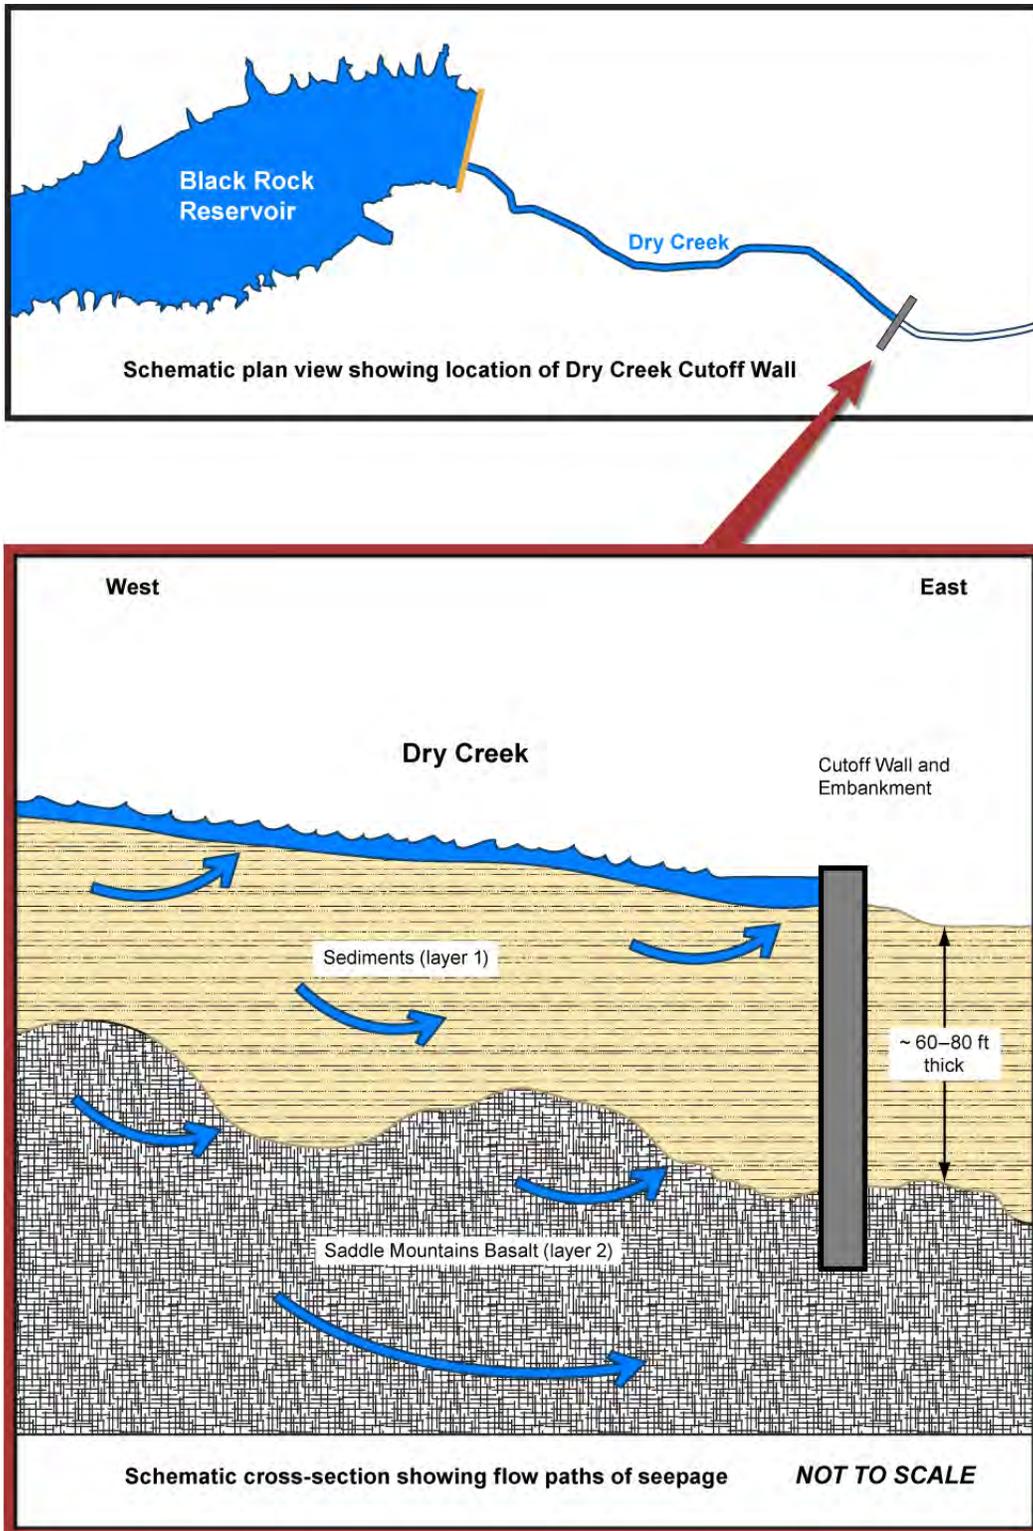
Illustration of embankment structure behavior. Above: plan view of structure. Below: cross section of structure.
